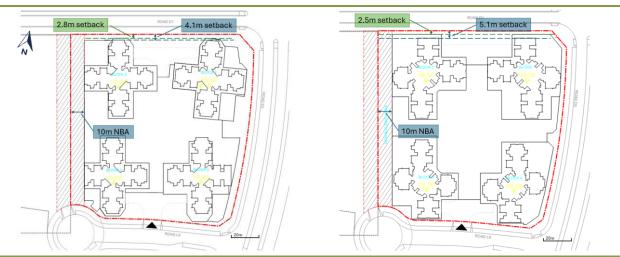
Master Layout Plan of Baseline Scheme (left) and Proposed Scheme (right) of Area 117
